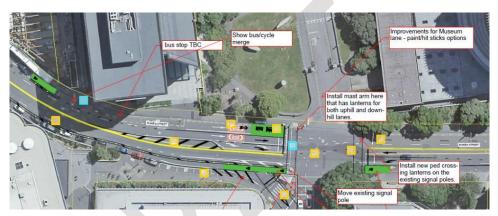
Excerpt from plan - Bowen Street / The Terrace intersection (C16)
